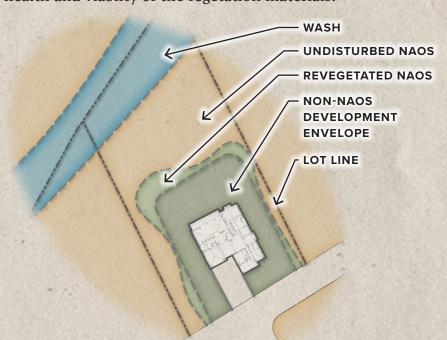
TYPICAL ON-LOT LANDSCAPE ZONES
